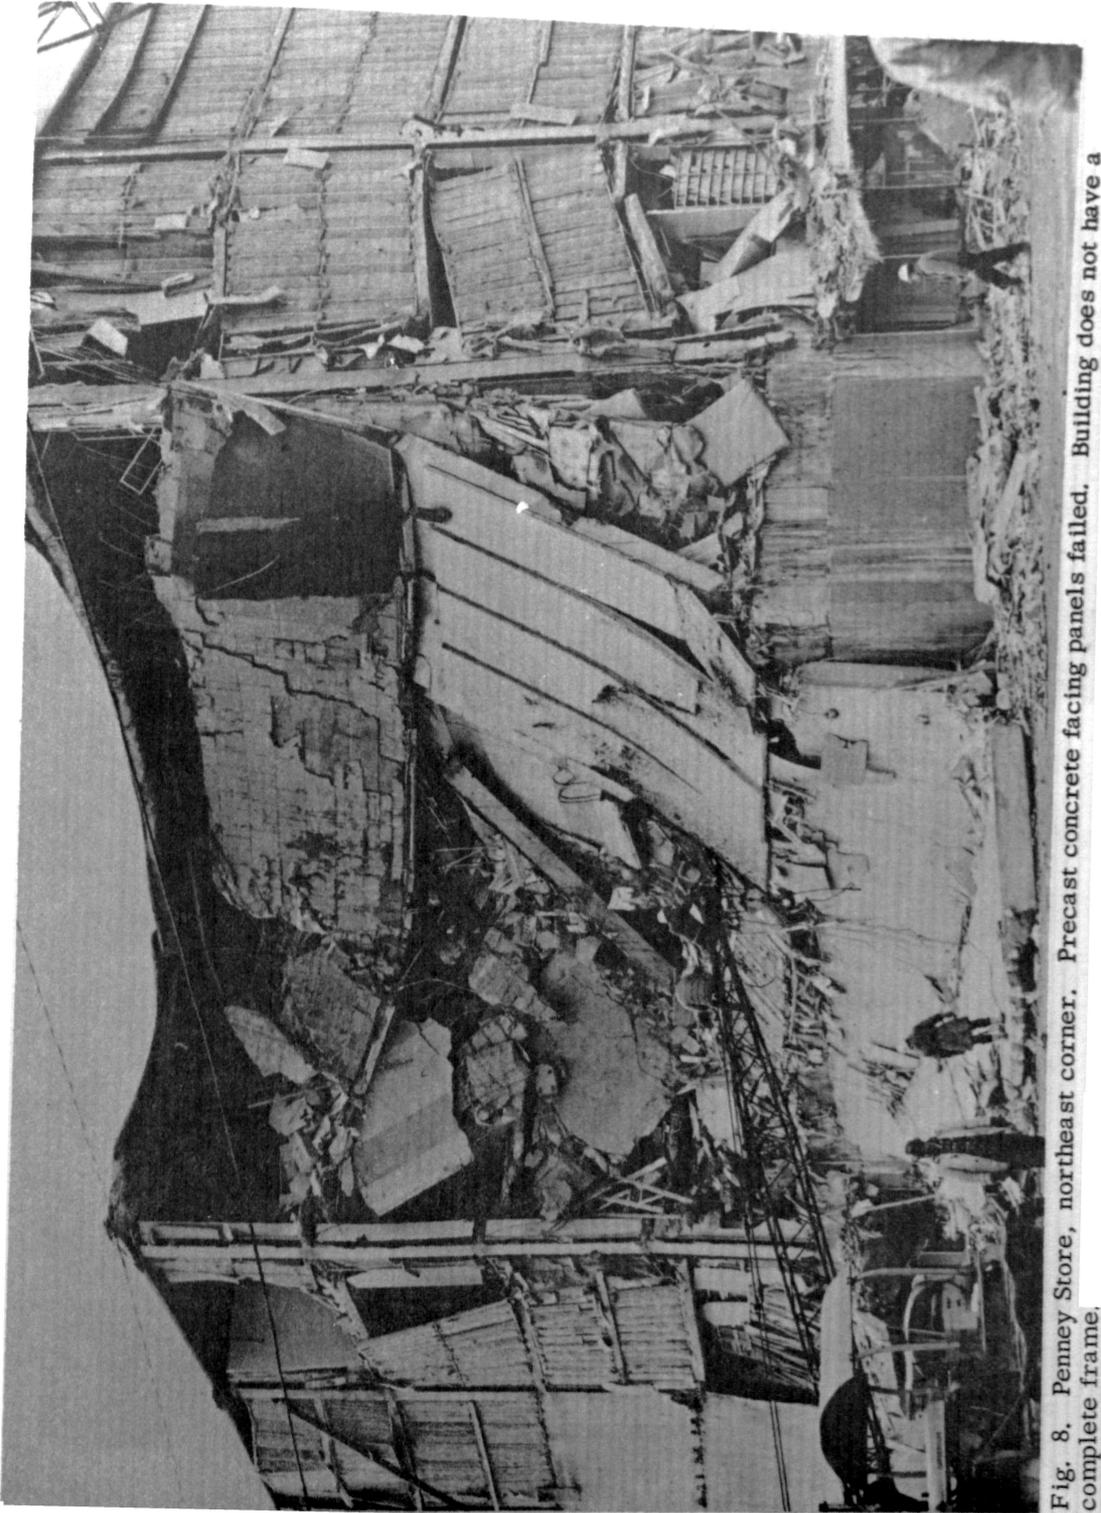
Penney Store, northeast corner. Precast concrete facing panels failed. Building does not have a complete frame.
